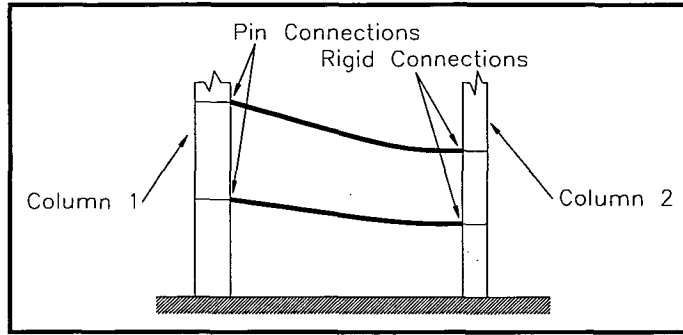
The effect of slab and beam deformations, when differential shortening occurs between columns 1 and 2 for the given connections.
